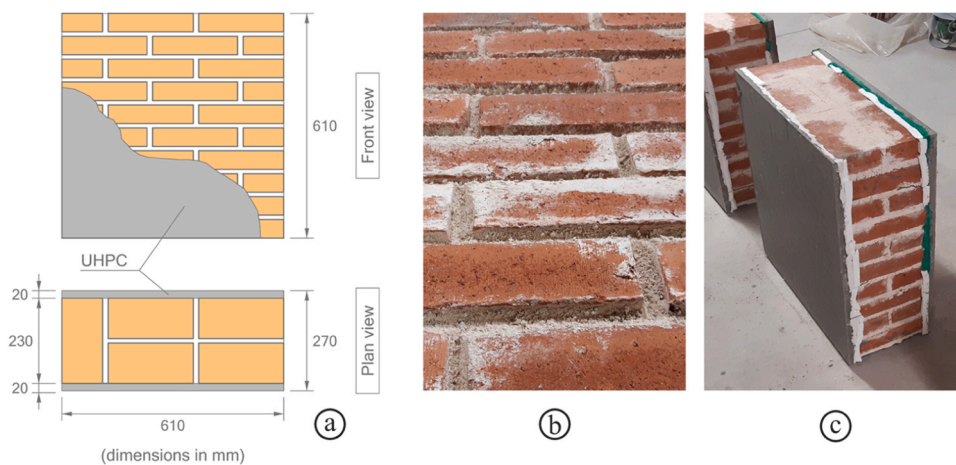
Panel manufacturing: (a) plan and front scheme; (b) detail of raked joints to improve UHPC-to-substrate bond; (c) masonry panel strengthened with UHPC.
